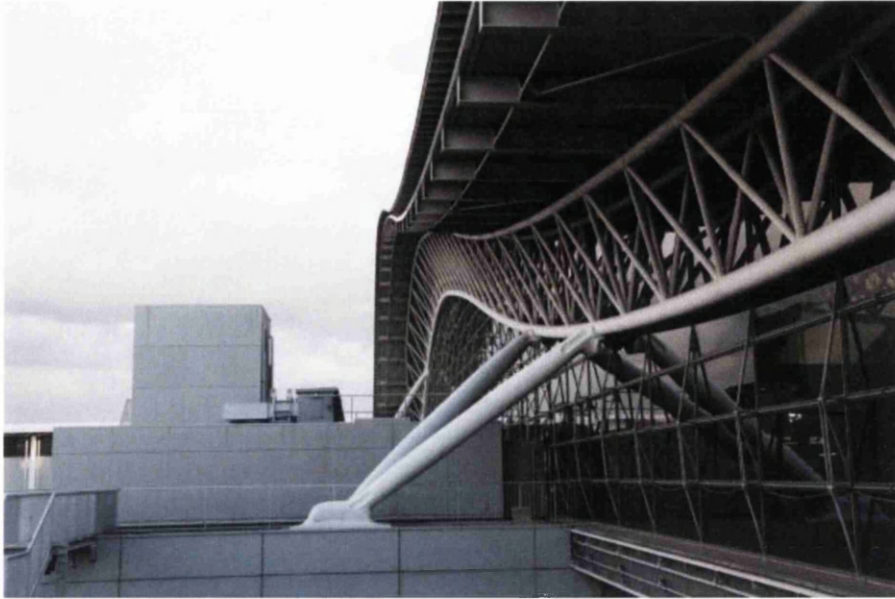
Detail of the roof at the Kansai International Airport, Osaka, Japan showing circular hollow sections
